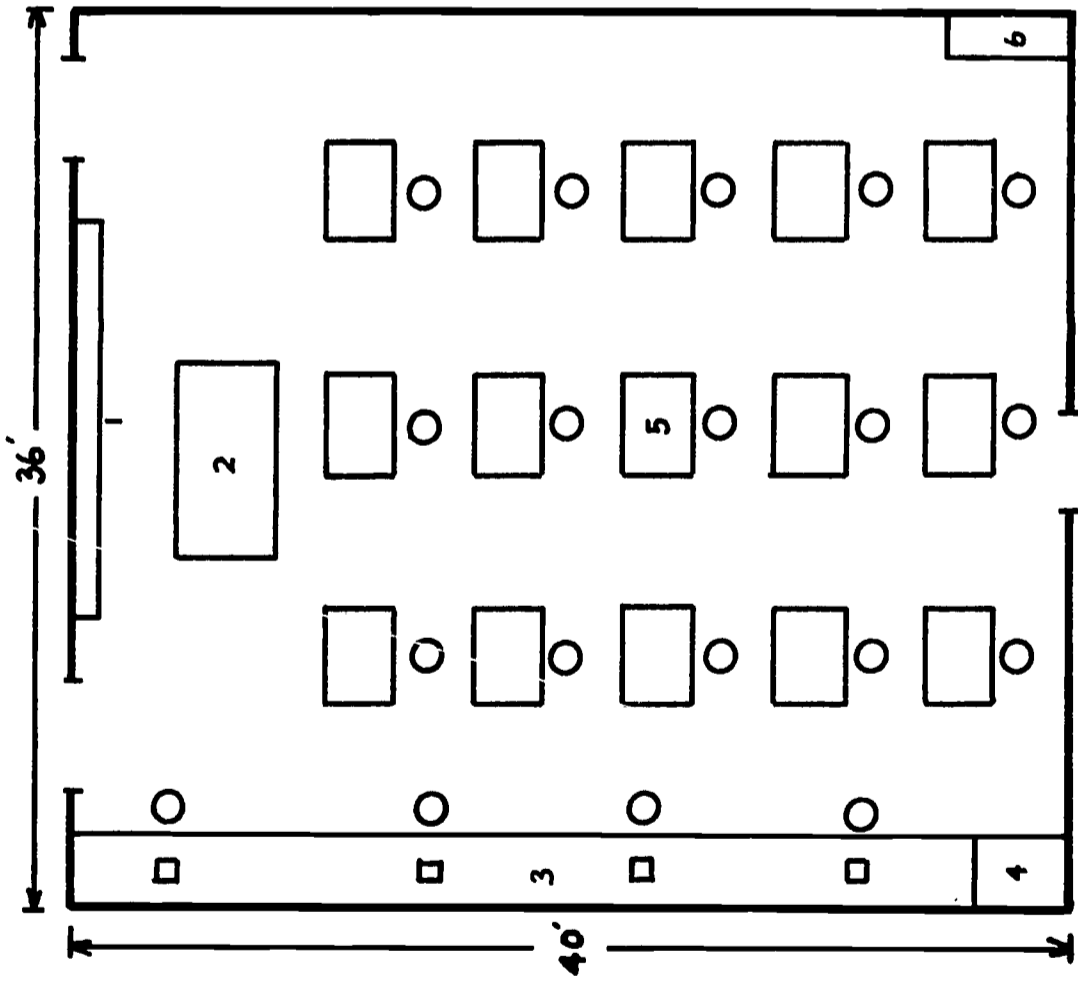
FIGURE I. SUGGESTED FLOOR PLAN FOR FORESTRY PROGRAM
